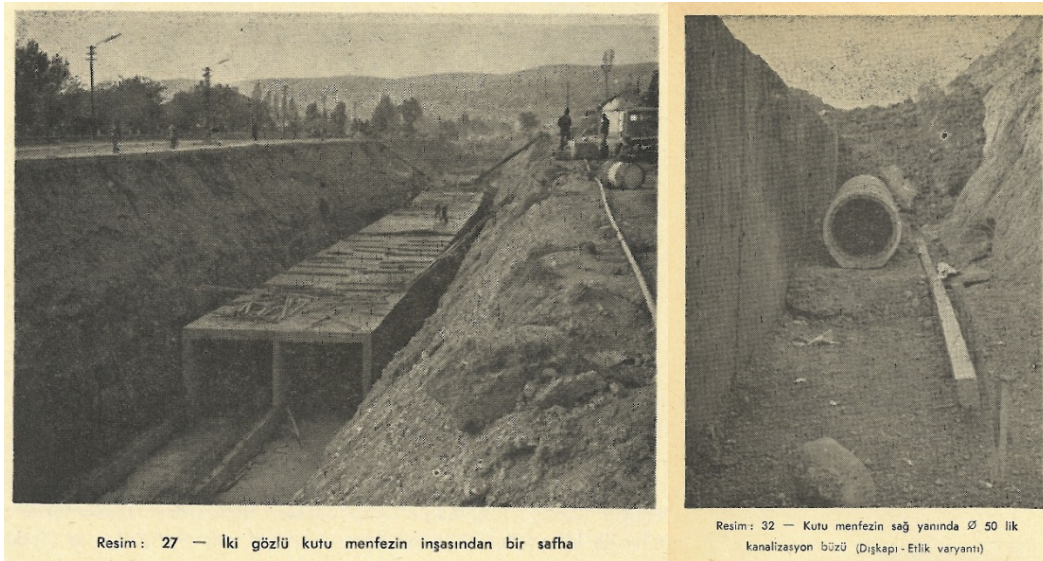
Concrete culvert while building for Hatip Stream and concrete pipe for wastewater.
